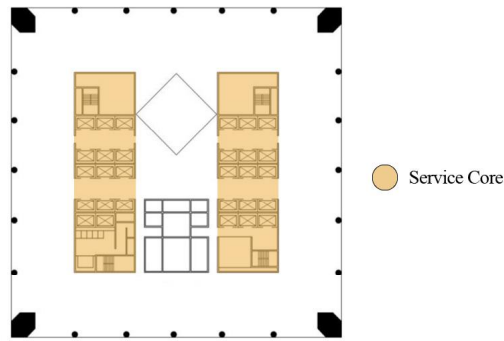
Bank of China, floor plan (Blake, 1991)
